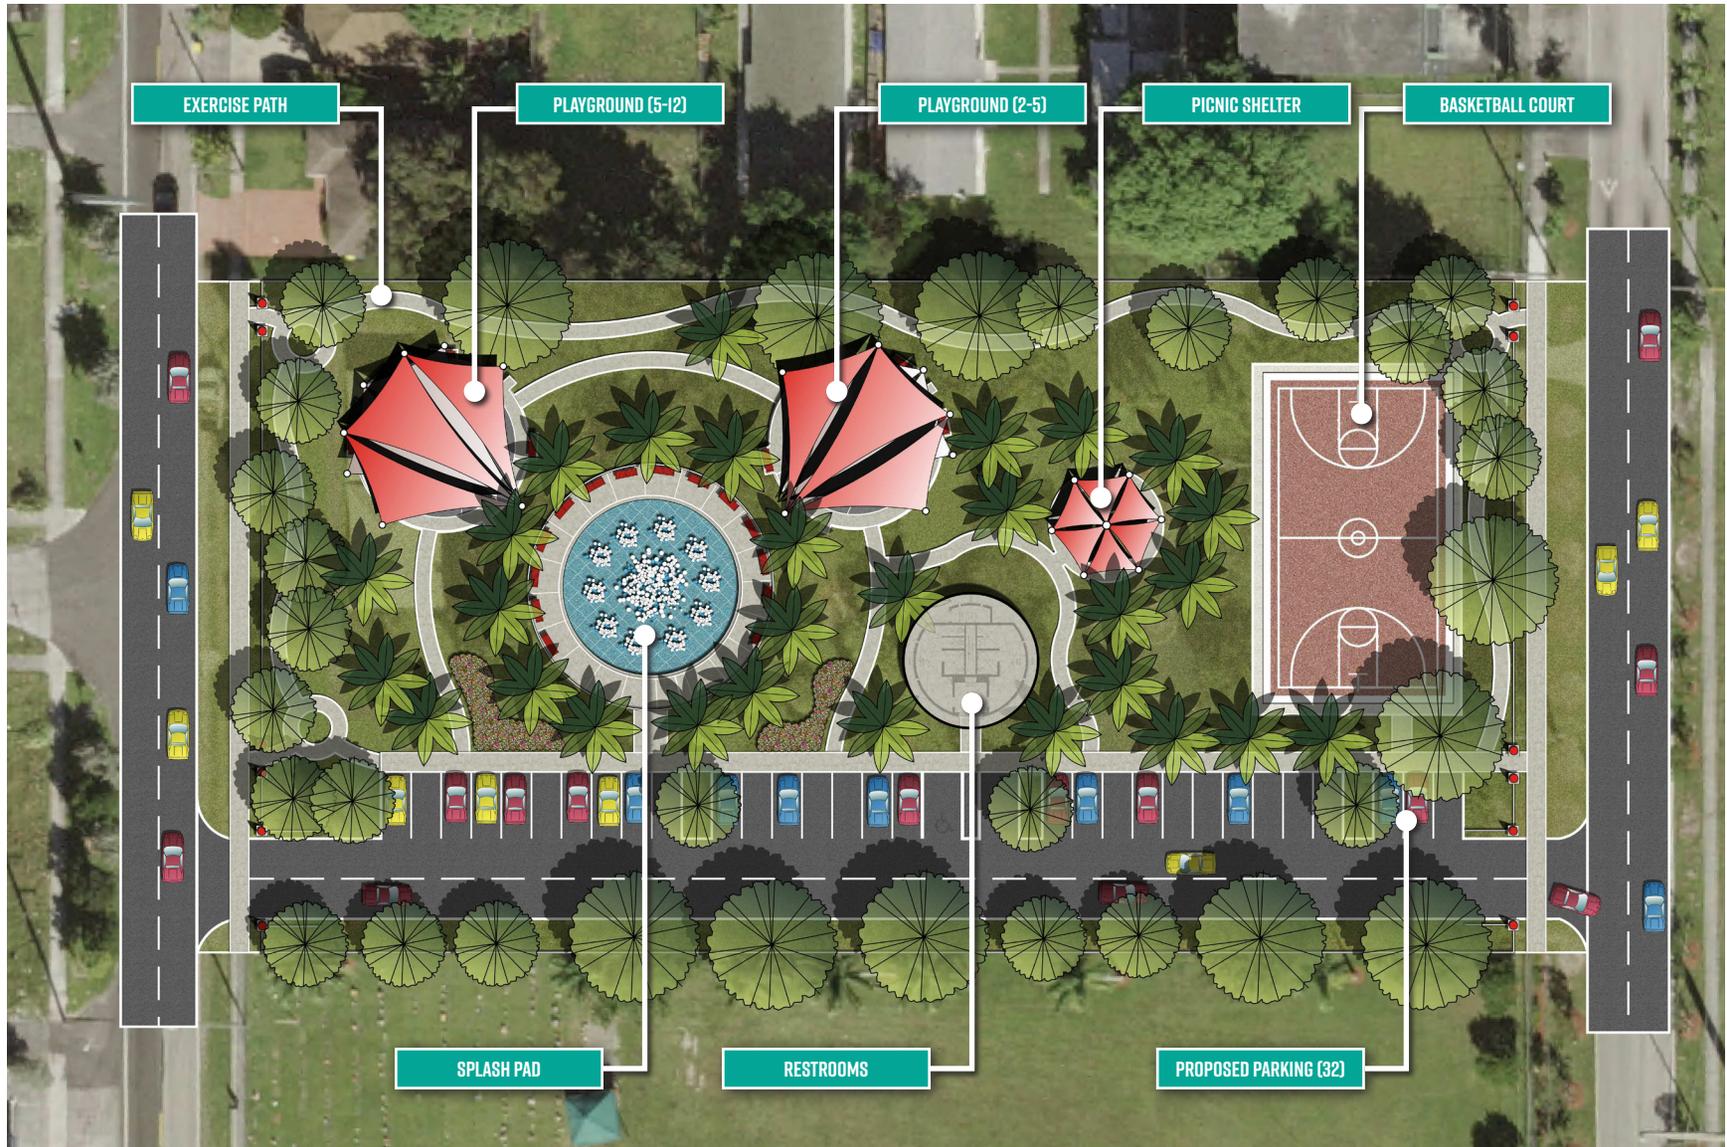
CONCEPT PLAN- CHESTER BYRD PARK CONCEPT PLAN
